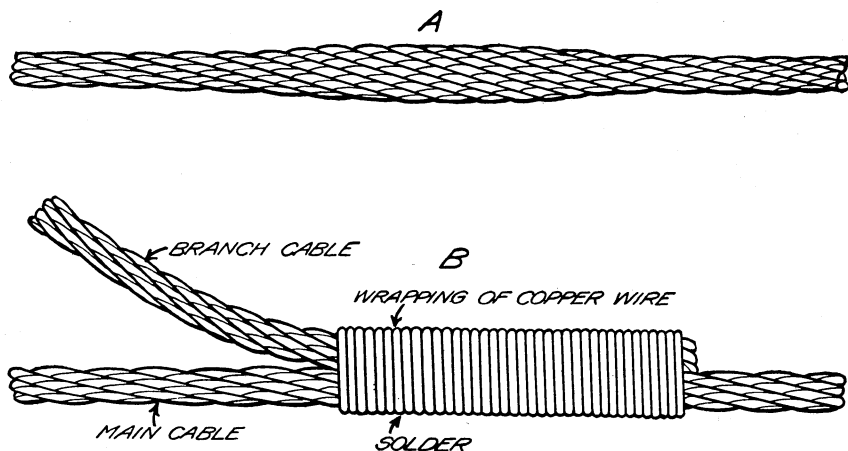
Other methods of forming conductor joints: A, End-to-end joints of copper cable; B, side branches.
